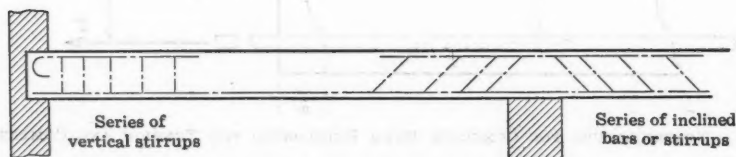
TYPICAL REINFORCED CONCRETE BEAM; WEB REINFORCED BY MEANS OF SERIES OF VERTICAL STIRRUPS, OR SERIES OF INCLINED BARS OR STIRRUPS.
